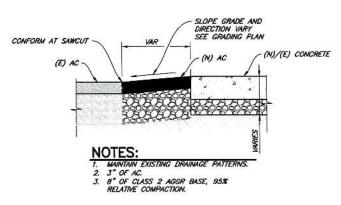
(CONCRETE SIDEWALK & CURB)
